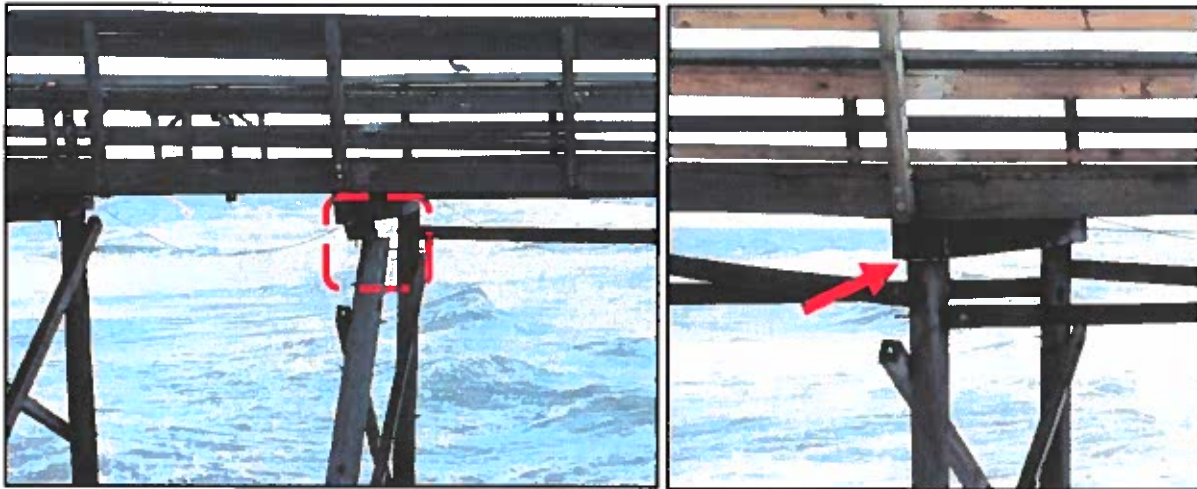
Photo of 50% bearing capacity pile (left), Photo of 100% non-bearing capacity pile (right) (air gap exists between pile and pile bent with only metal straps providing support)
